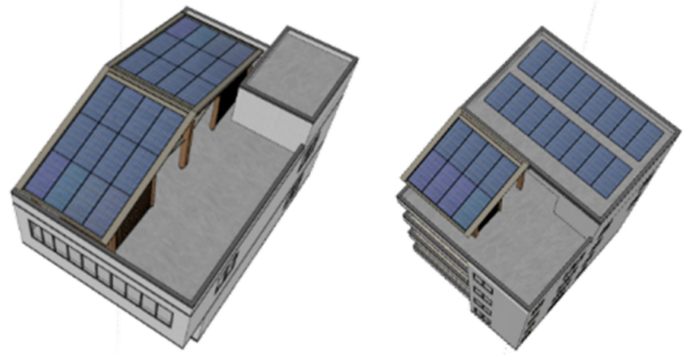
Construction combinations of photovoltaic sun pavilions for farmhouse renovation
